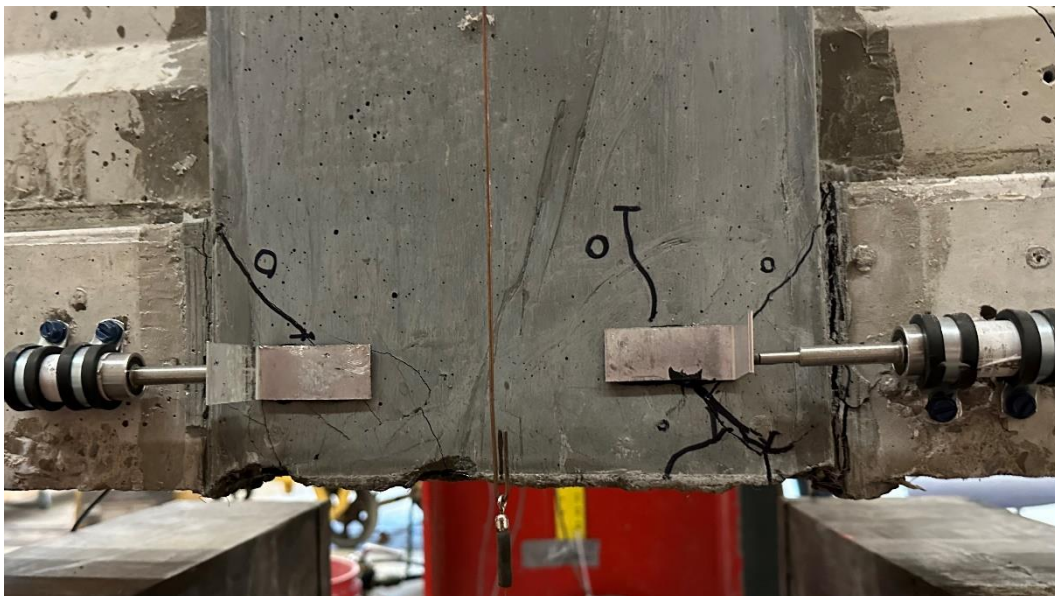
East side of joint SSDU-2 showing cracks near the as-cast top face of the joint under final negative moment test loading
